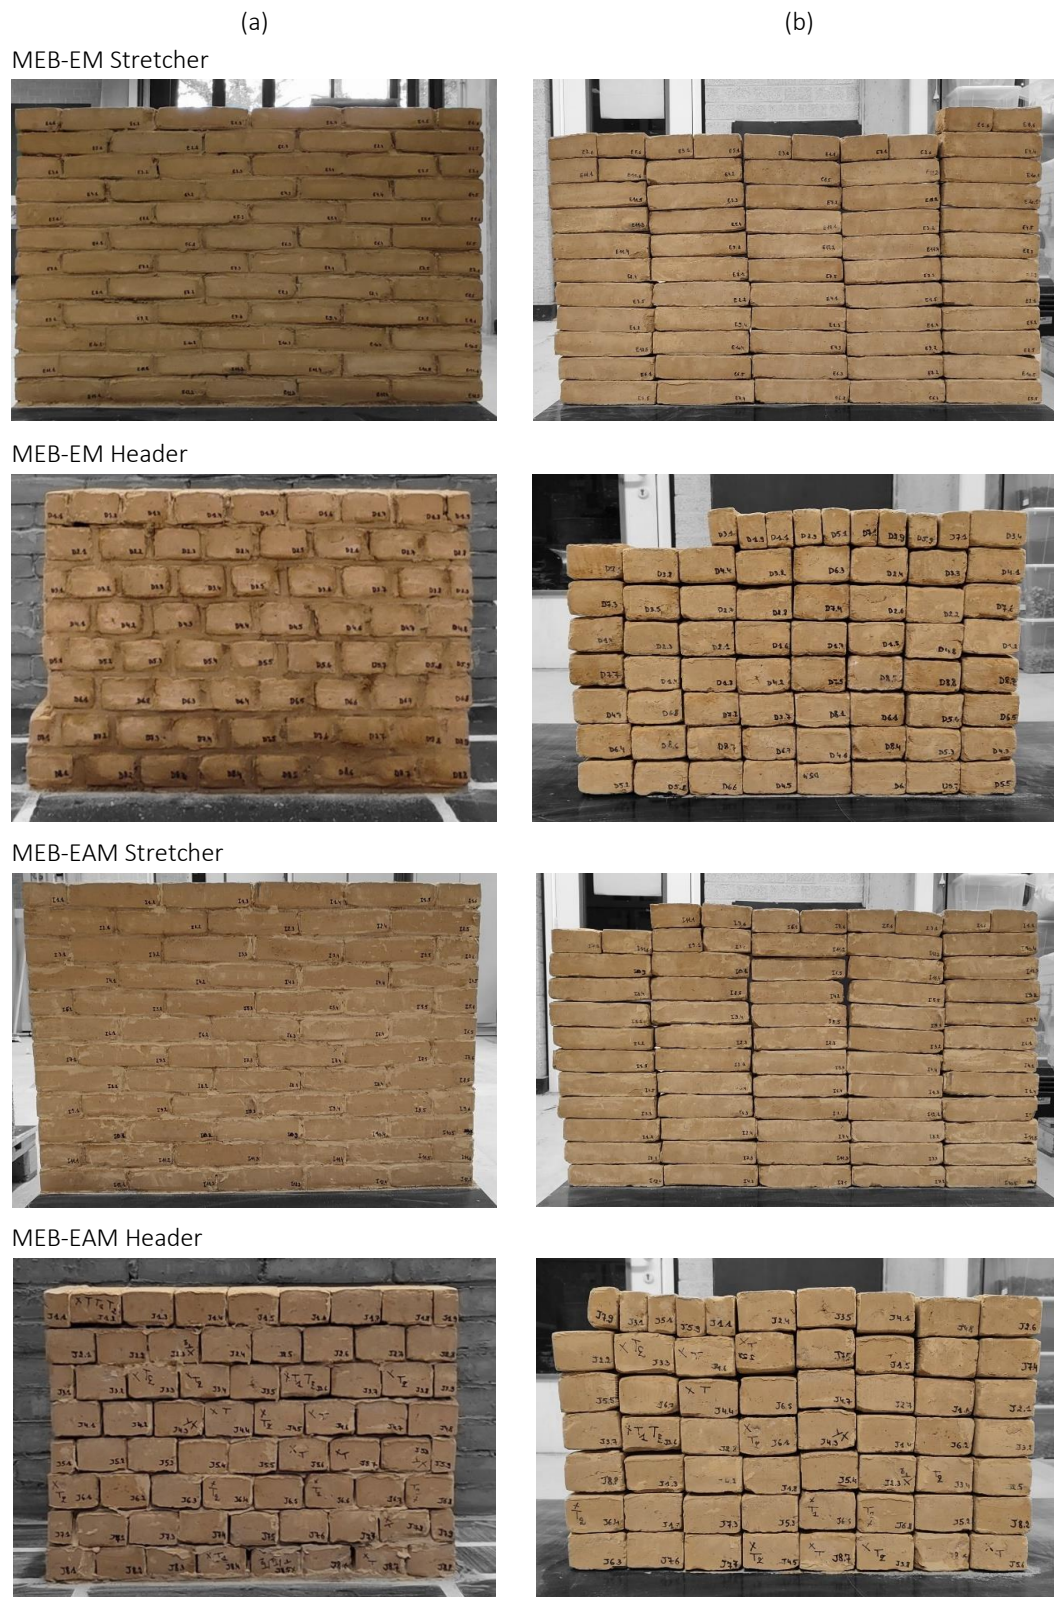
Sample walls before deconstruction (a) and earth blocks after cleaning (b).
